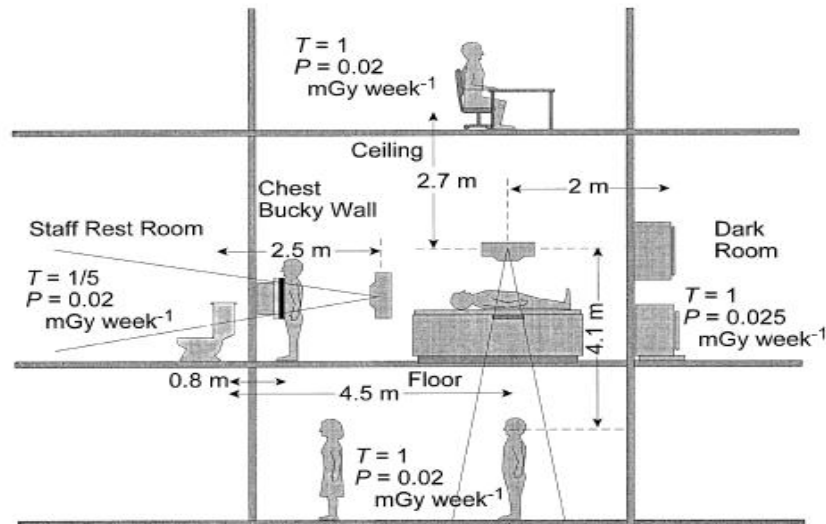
Elevation drawing of the radiographic room. The dimensions are used in sample calculations in Section 5.3. This same layout is also used for the R&F room examples in Section 5.4, with the addition of a fluoroscopy x ray tube beneath the table and an image intensifier over the table.
